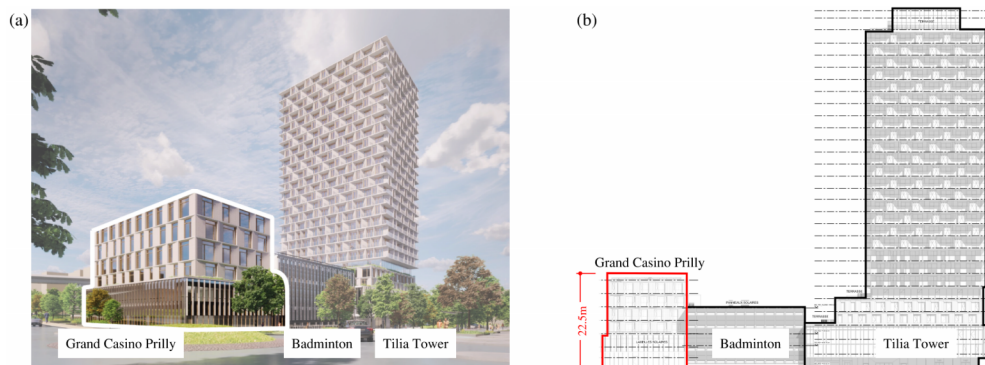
Les Balcons du Viaduc. (a) view of project area; and (b) south elevation
